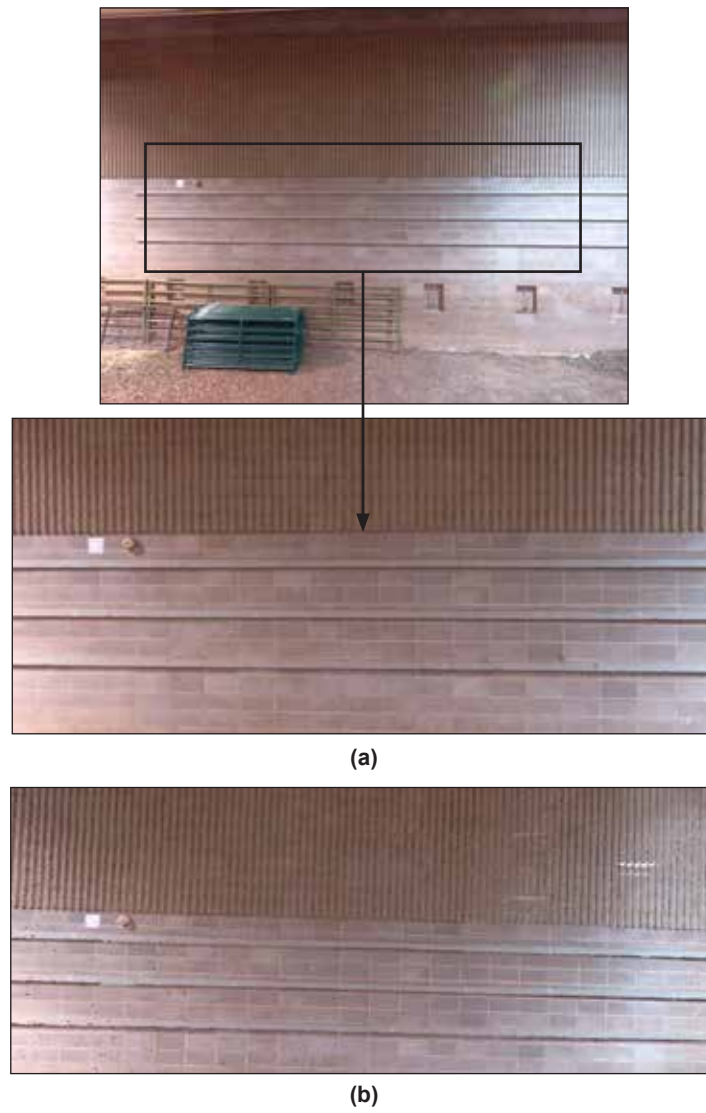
Wall recreated using PhotoScan: (a) wall; (b) wall 3D representation.
